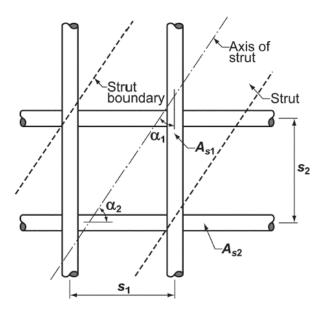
Reinforcement crossing a strut (ACI Committee 318, 2014)
